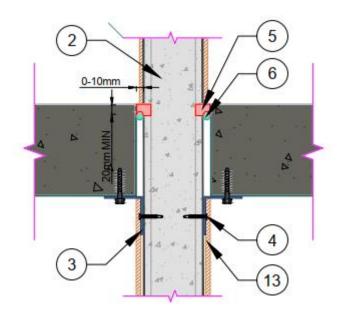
Dual wall system with vertical wall between horizontal walls – gap width of 0-10 mm between the stair and vertically oriented wall
